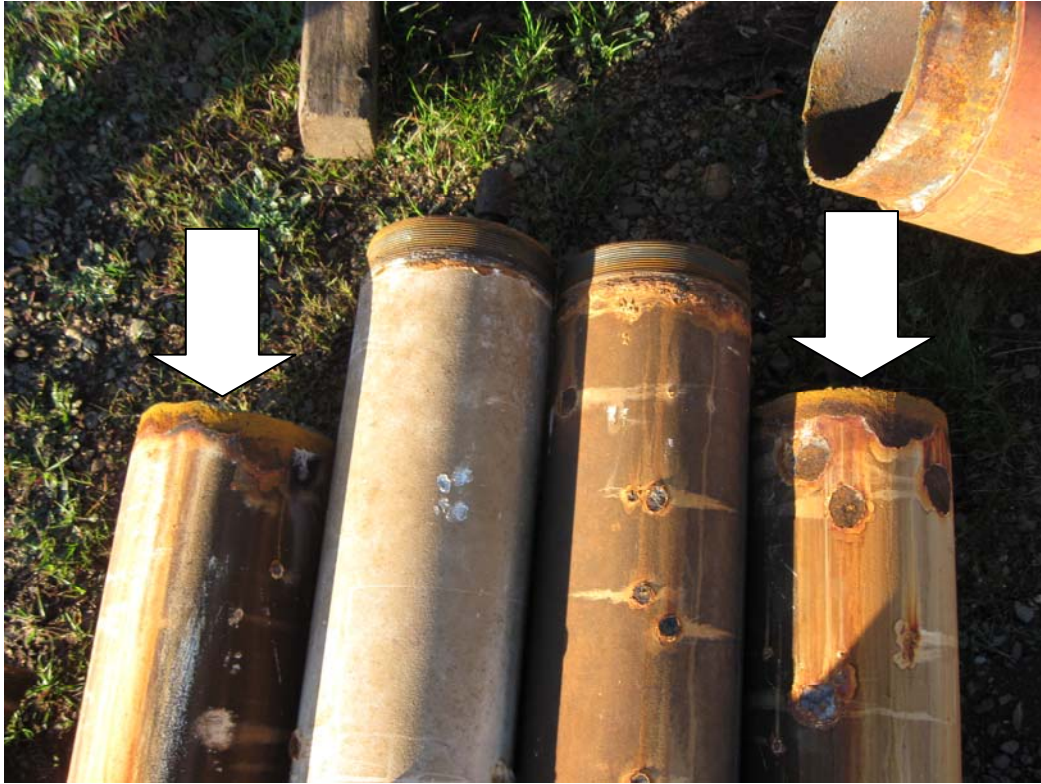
Pipe columns cut to remove from wetwell, need to replace column sections
